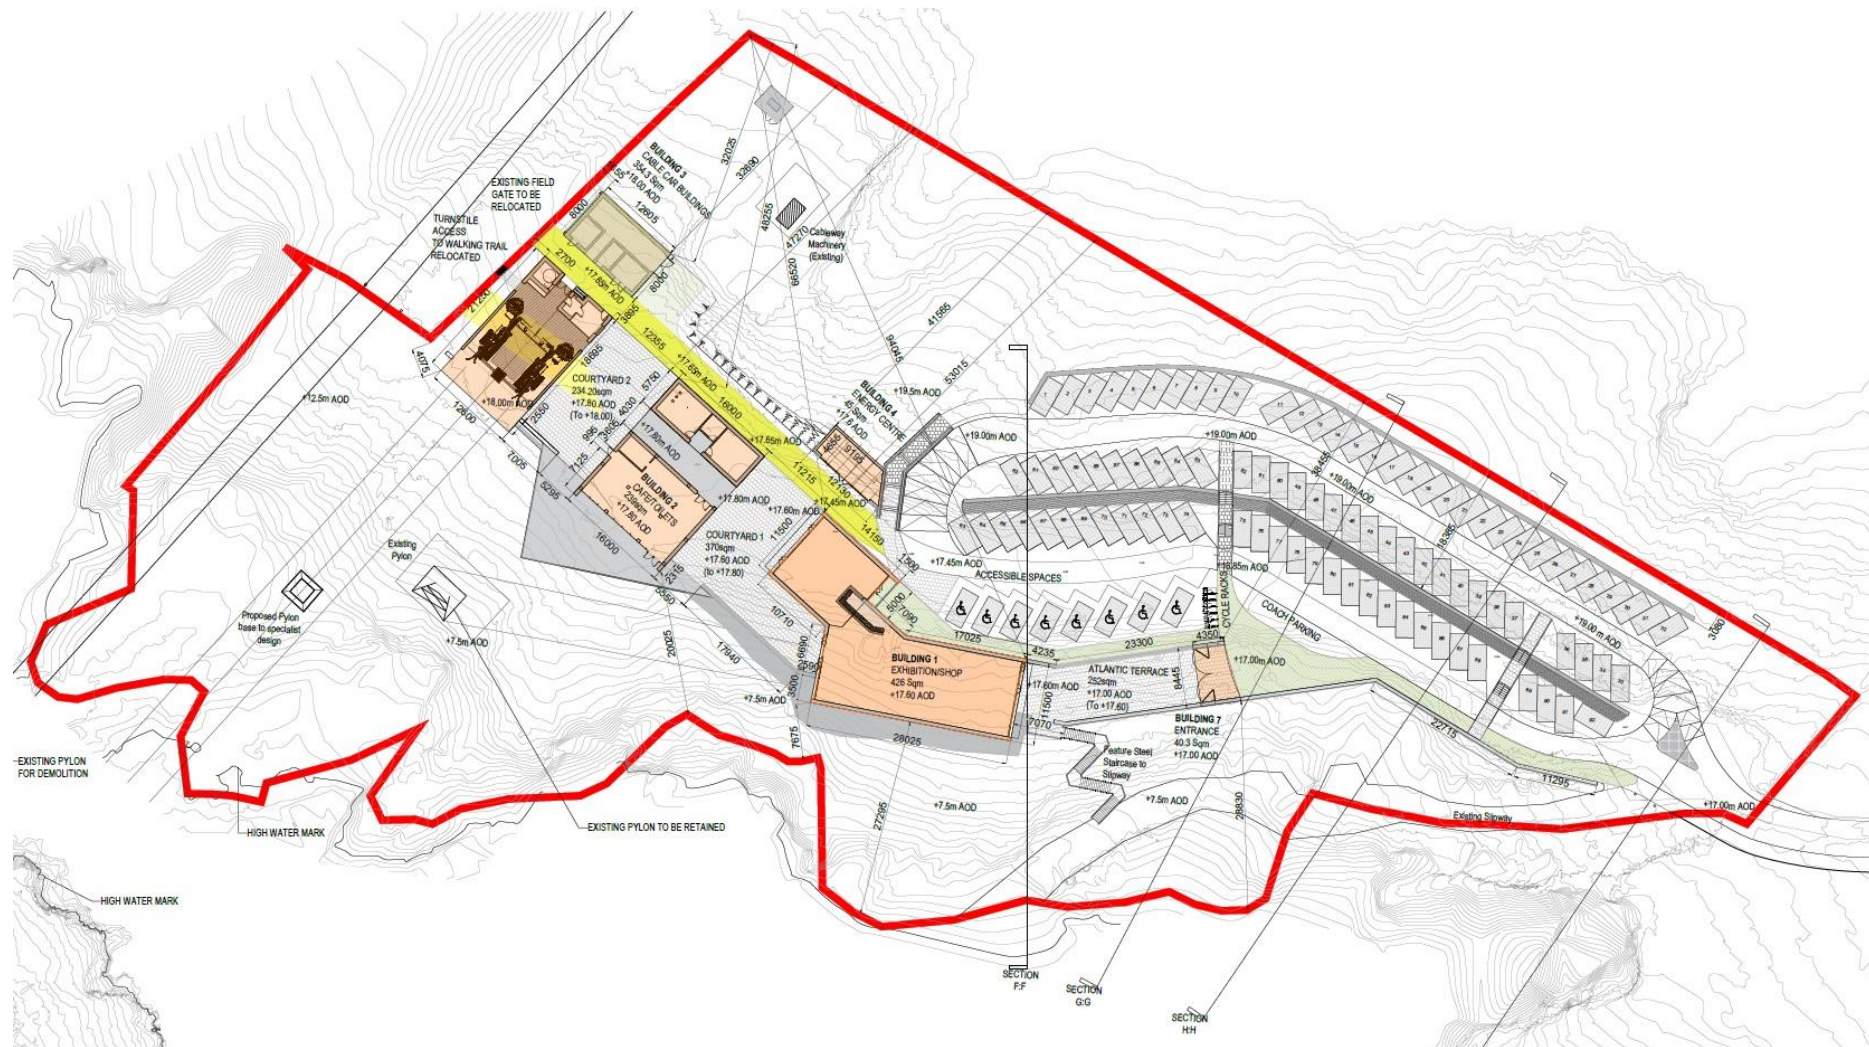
Proposed layout of mainland side of site (not including R572 works)
